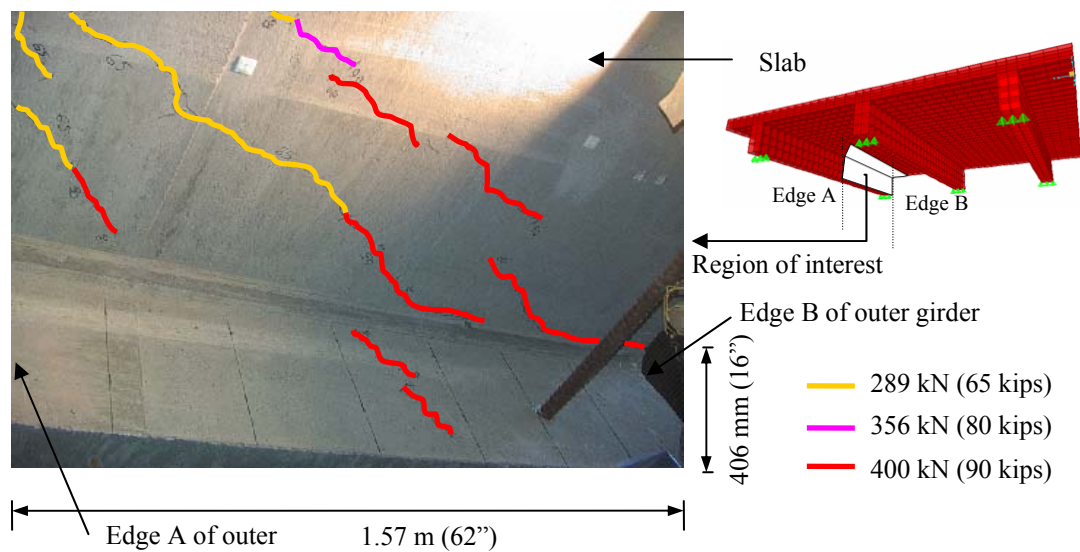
Progression of cracks in the deck slabs below load area
